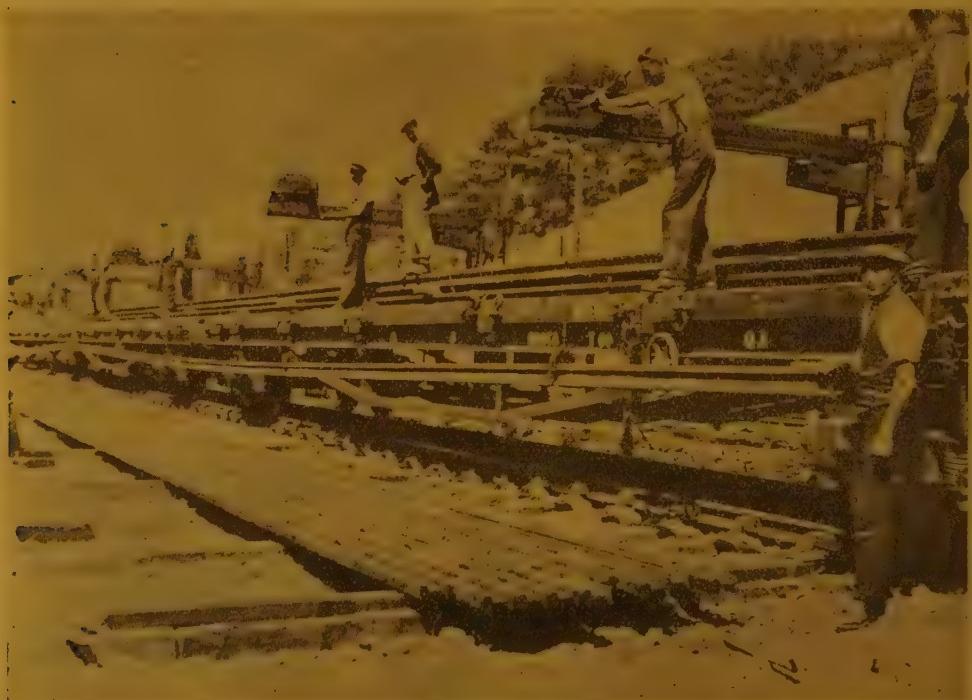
Laying welded rails with « Robel » cranes. British Railways.
